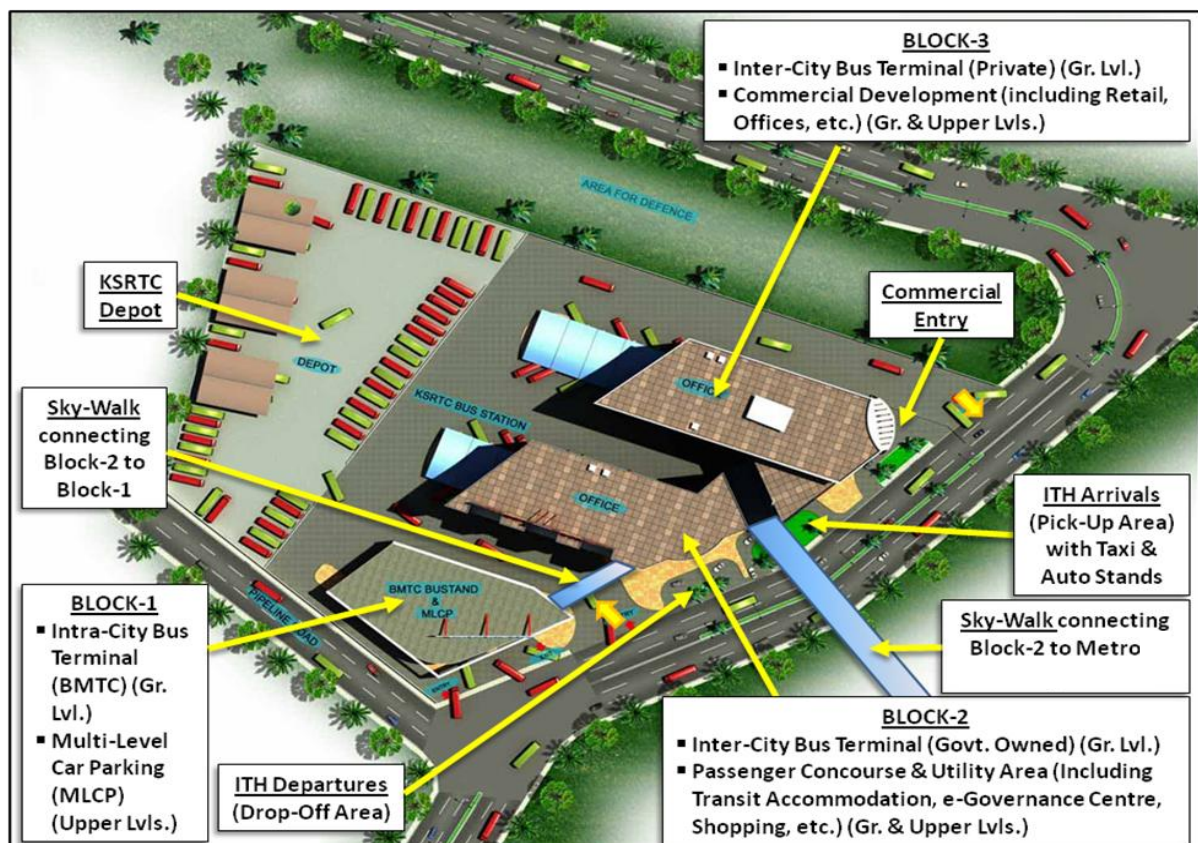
On-Site Infrastructure at Peenya ITH site (Suggested Plan)
